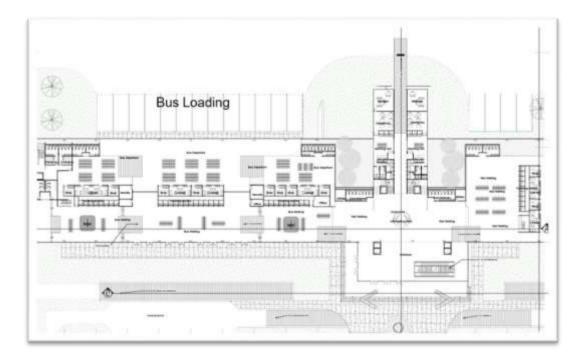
Proposed ground floor plan blowout Source: Researcher's design proposal, (2020)
